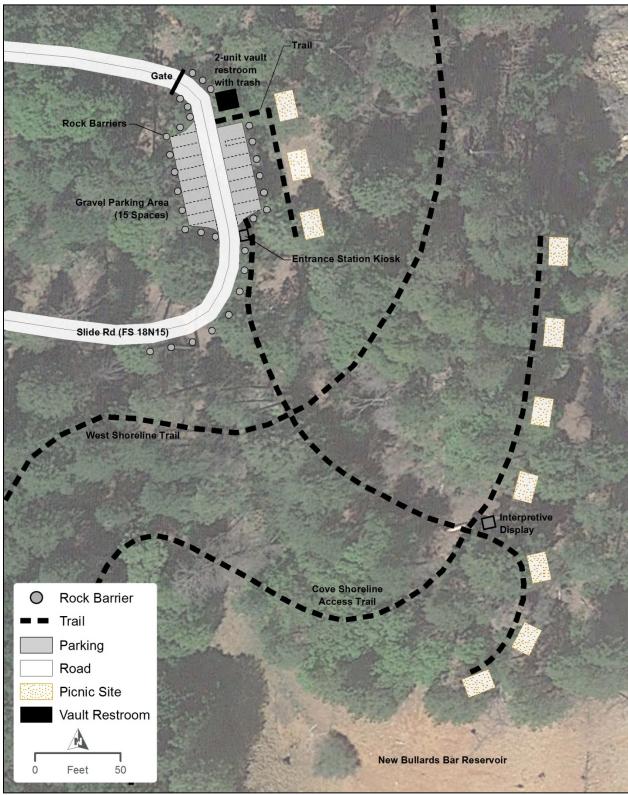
Conceptual layout for Cottage Creek Picnic Site.
